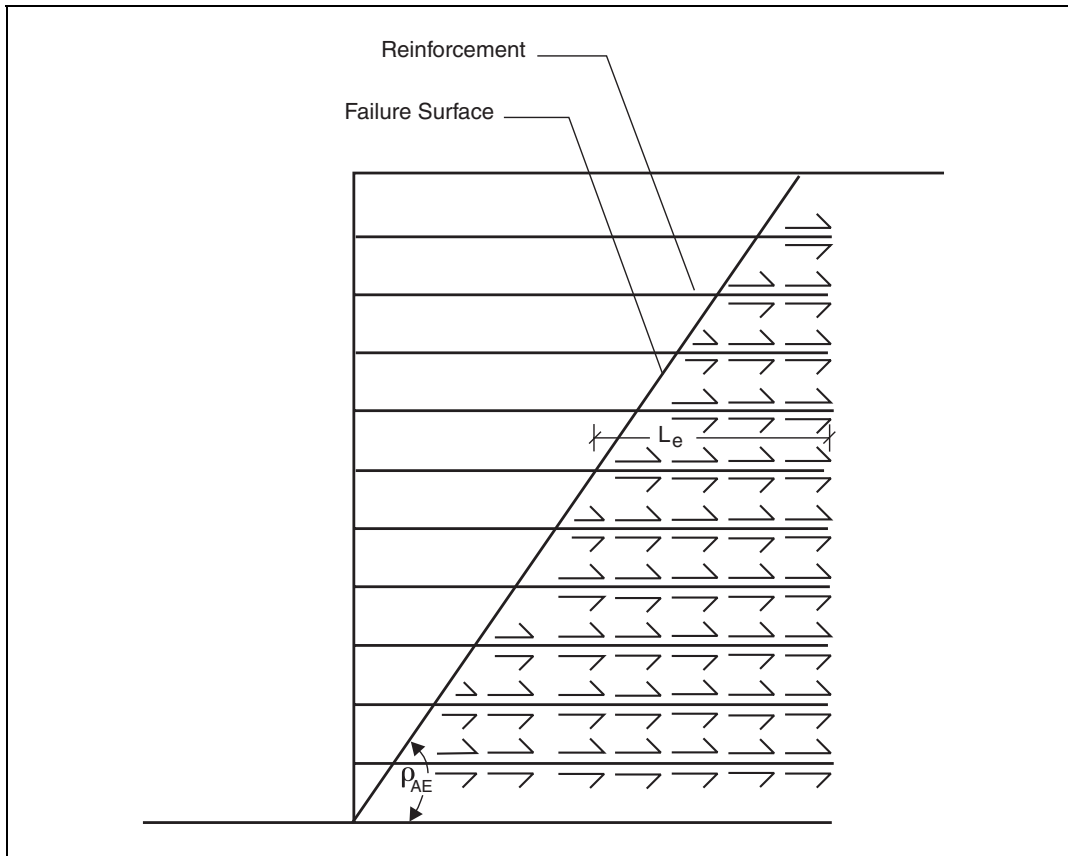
Assumed failure surface within the reinforced wall fill.
